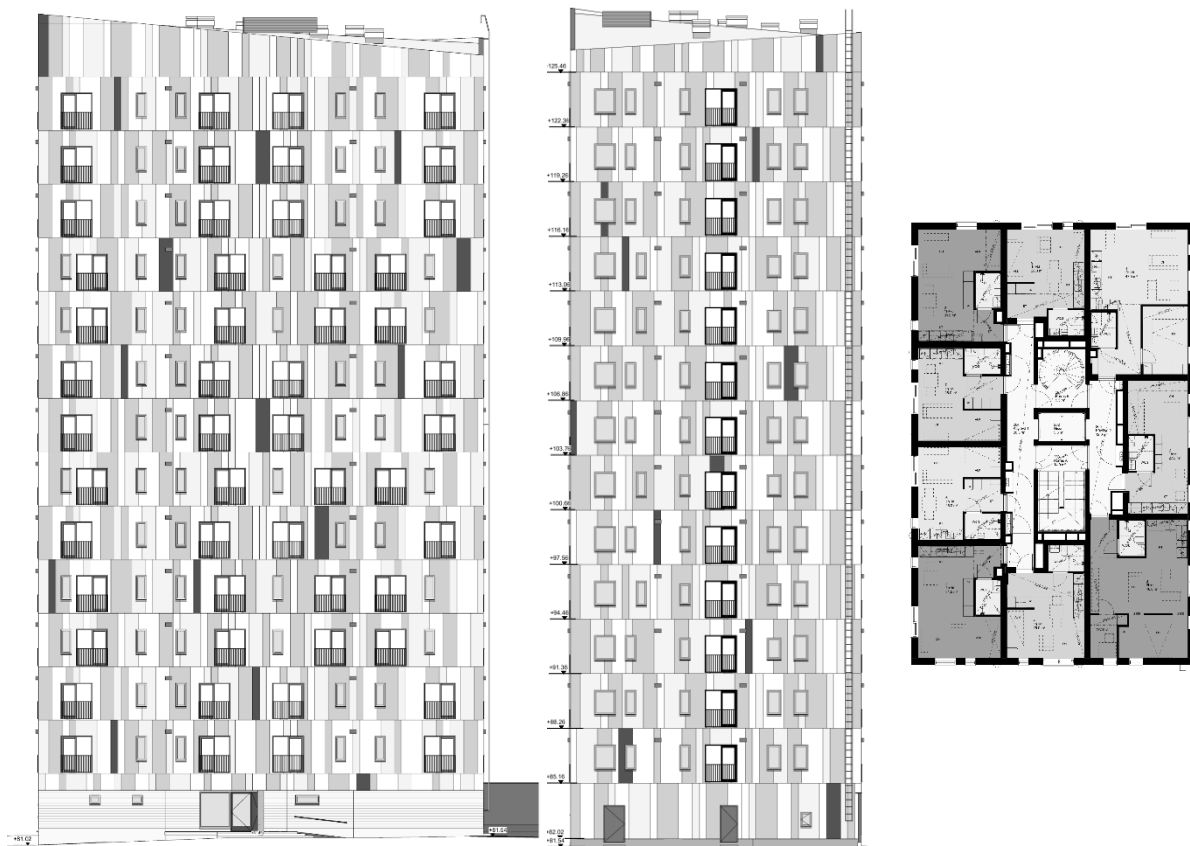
Elevations and a floor plan picture of Lighthouse Joensuu. Courtesy of Arcadia Oy Arkkitehtitoimisto
